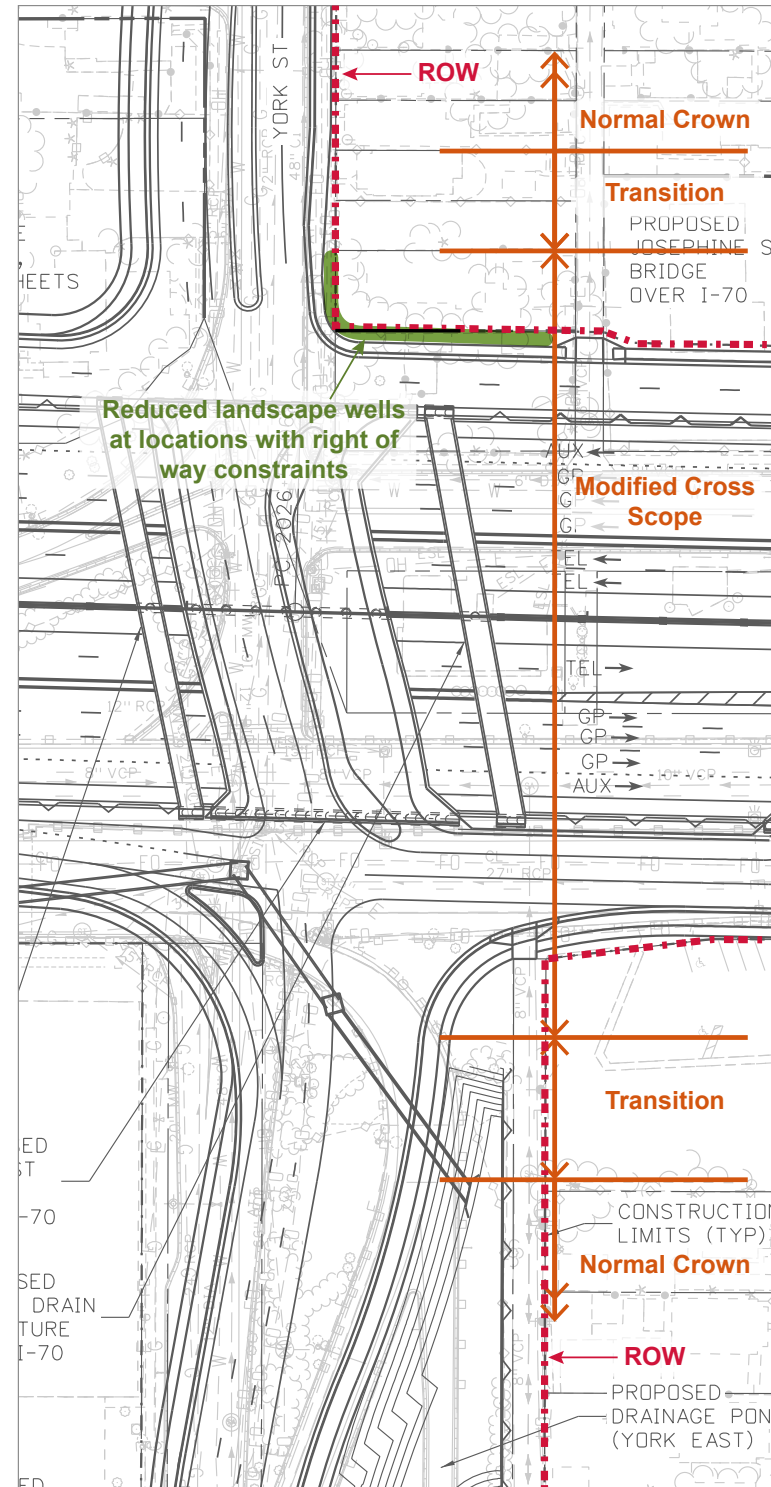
Typical cross street cross slope plan (York St. shown, others similar)
